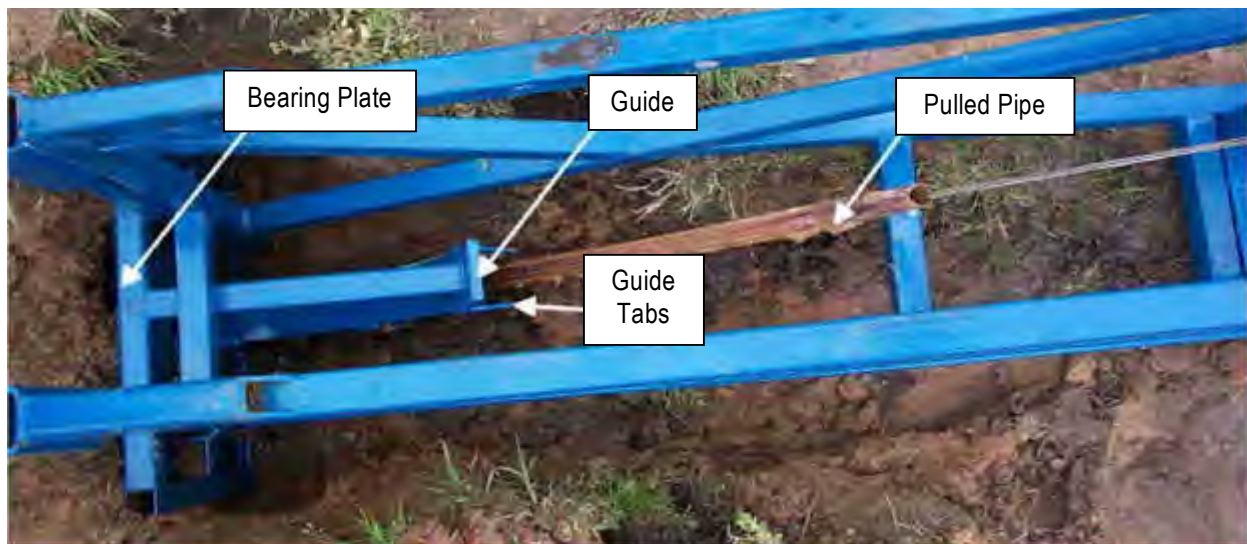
Top view of lateral frame and bearing plate assembly during a pulling operation.
